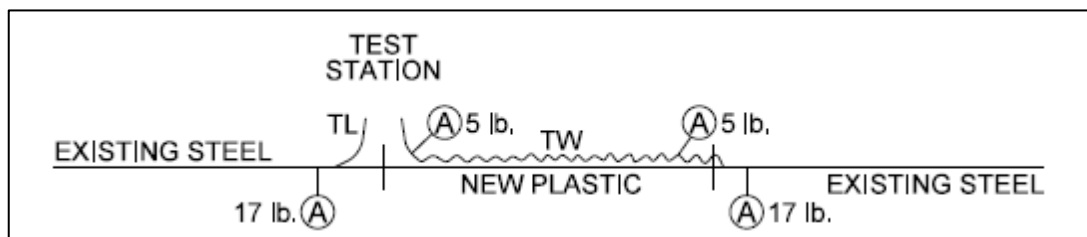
New Plastic Installed Between Two Sections of Existing Steel
